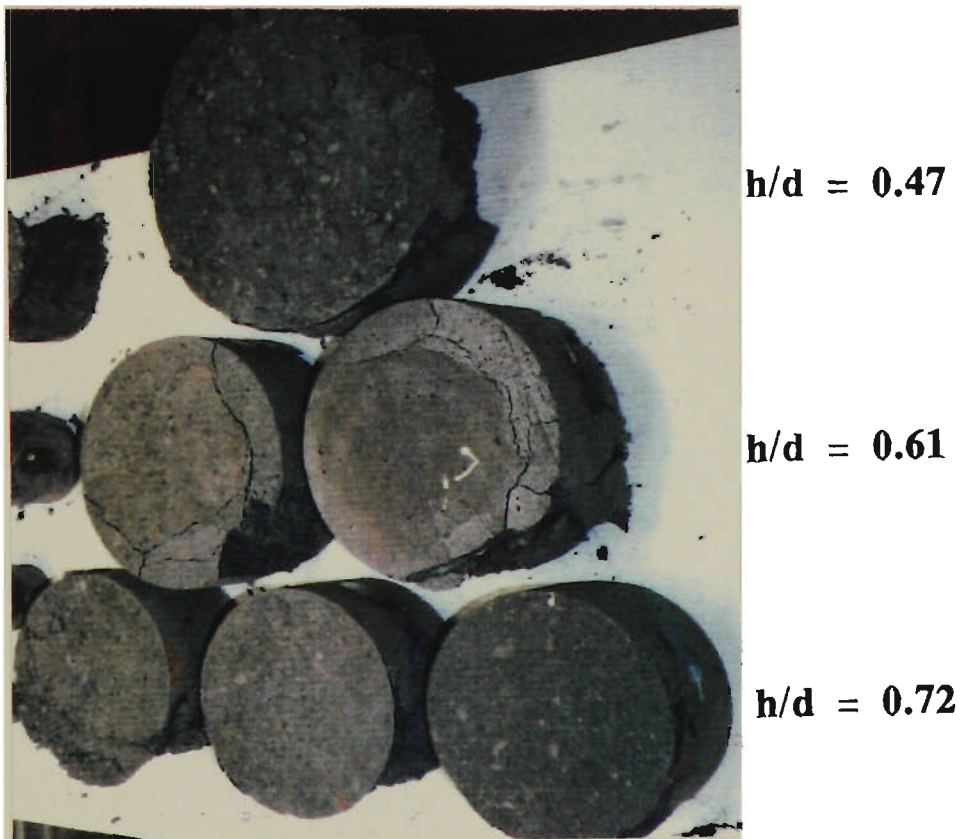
Various CCWR models at complete failures (End elevation C).
